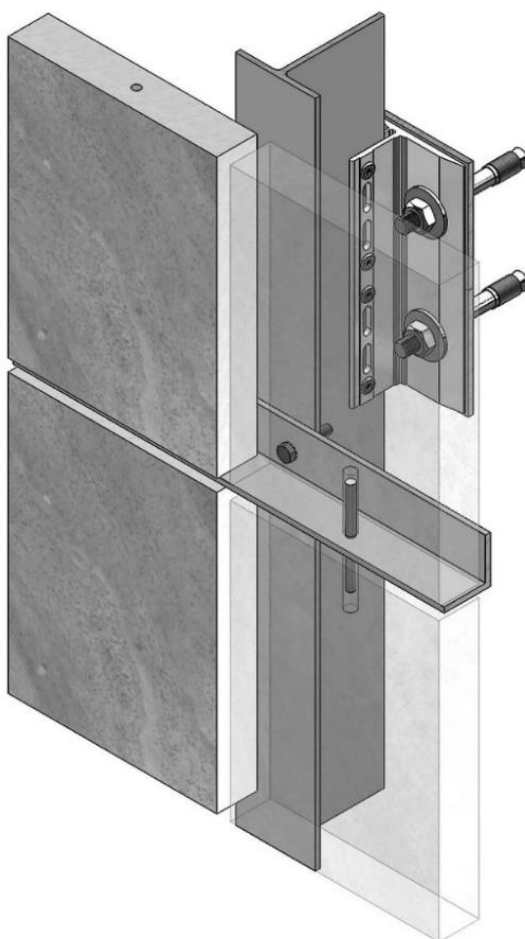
Facade Cladding System – Stainless steel fixing [78]
